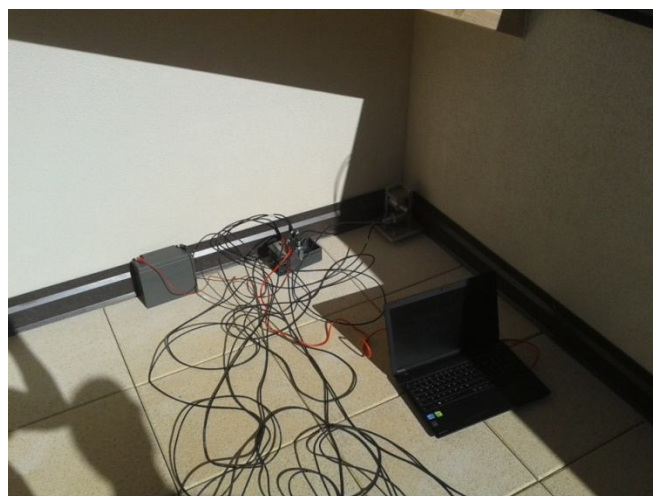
Test equipment in place on the top storey of the CLT building – the reference accelerometers are shown, as is the battery, data acquisition system and laptop, with the roving accelerometers elsewhere on the structure
